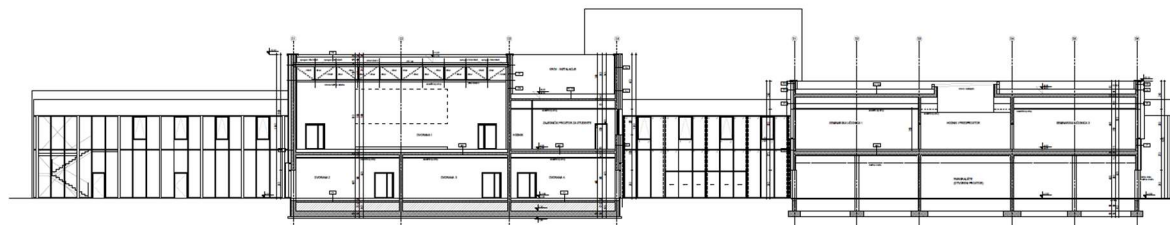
Longitudinal Section of the FOI 2 Building, Main Architectural Design, July 2025
